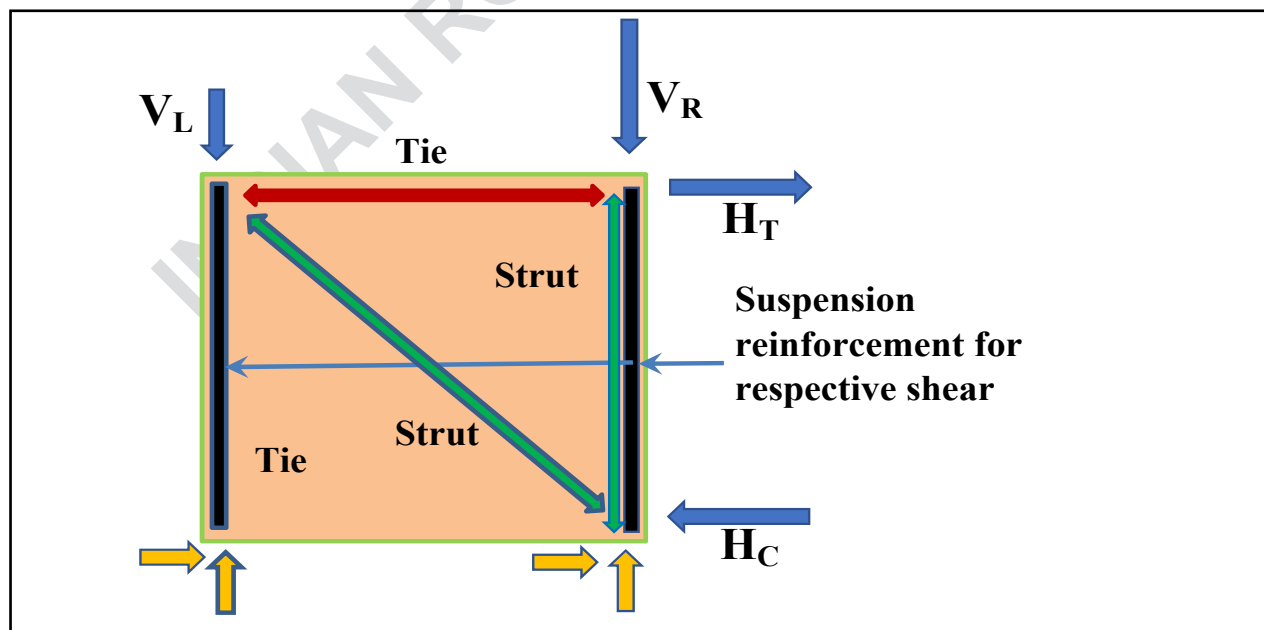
Strut & Tie Model for Design of Web wall between the twin leaf piers
